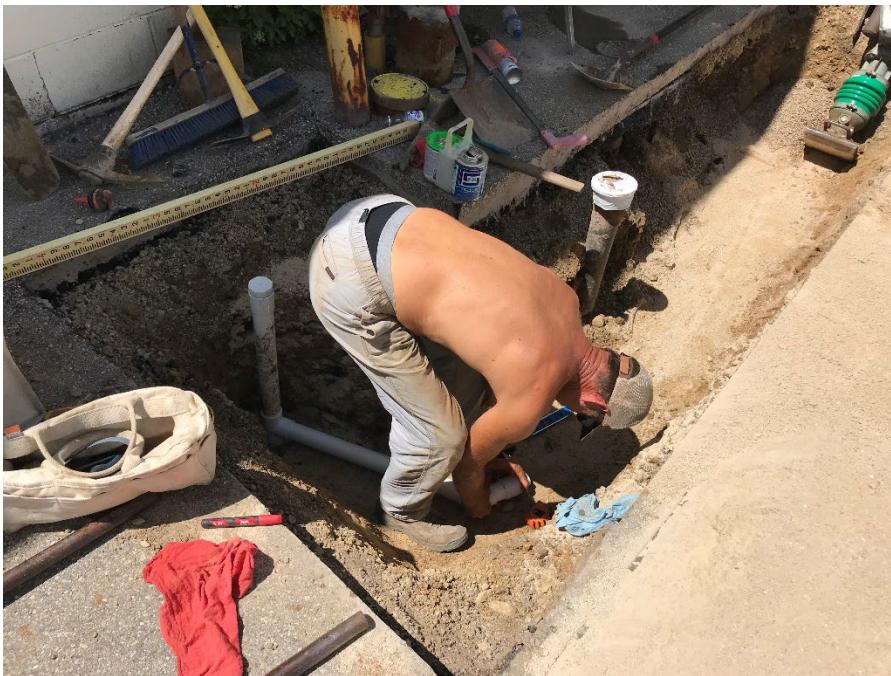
Installing 2-inch diameter PVC piping to SVE well SVE-3.
